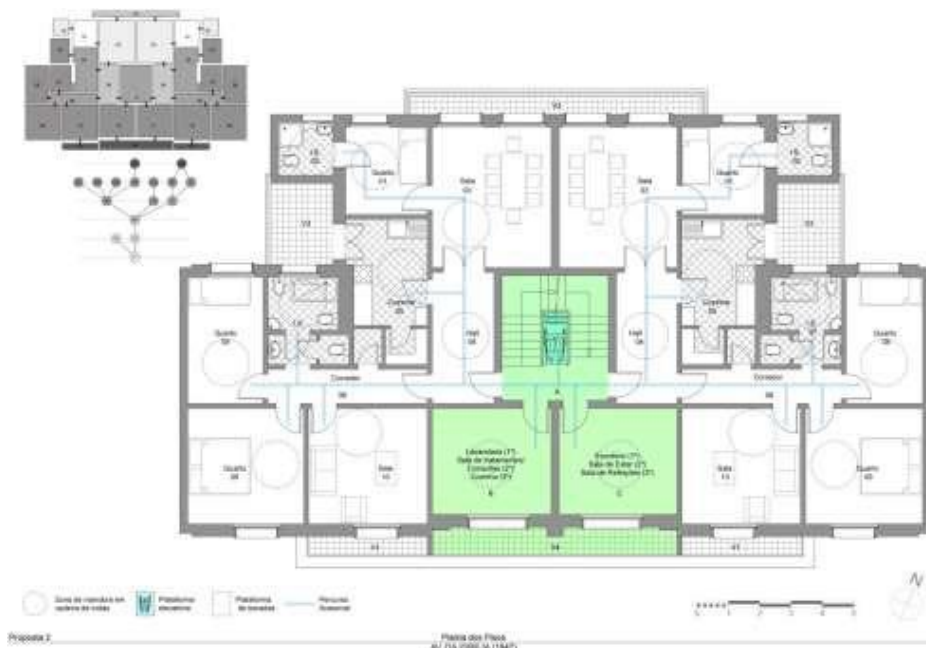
Av. da Igreja, central building in the blocks – typical floor plan – Proposal 2. (Source: Carvalho, 2013 redrawn after Silva and Faria da Costa, 1947).
